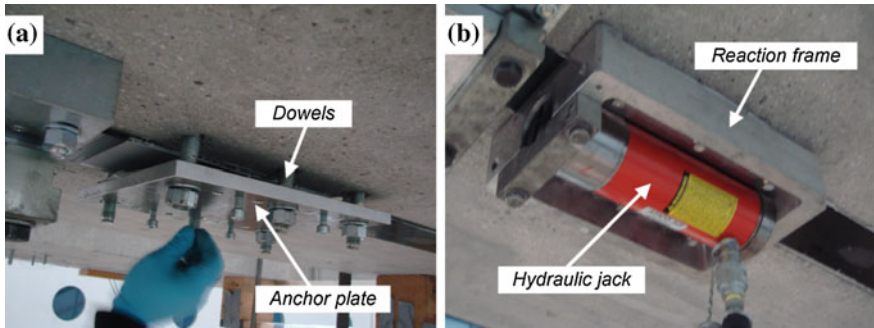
a Anchor plate during installation and b reaction frame with hydraulic jack
